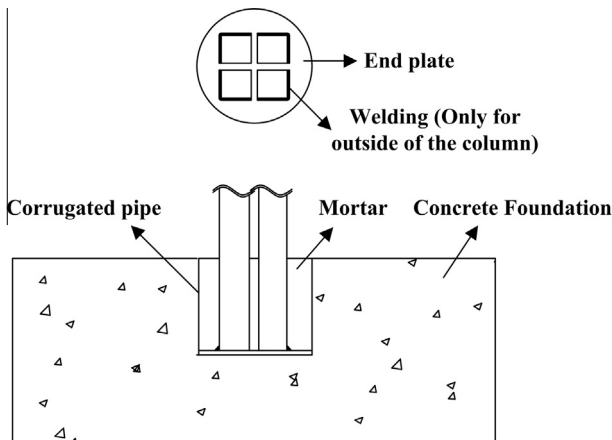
Proposed column-to-foundation embedment connection for interior column of modular unit structure.
